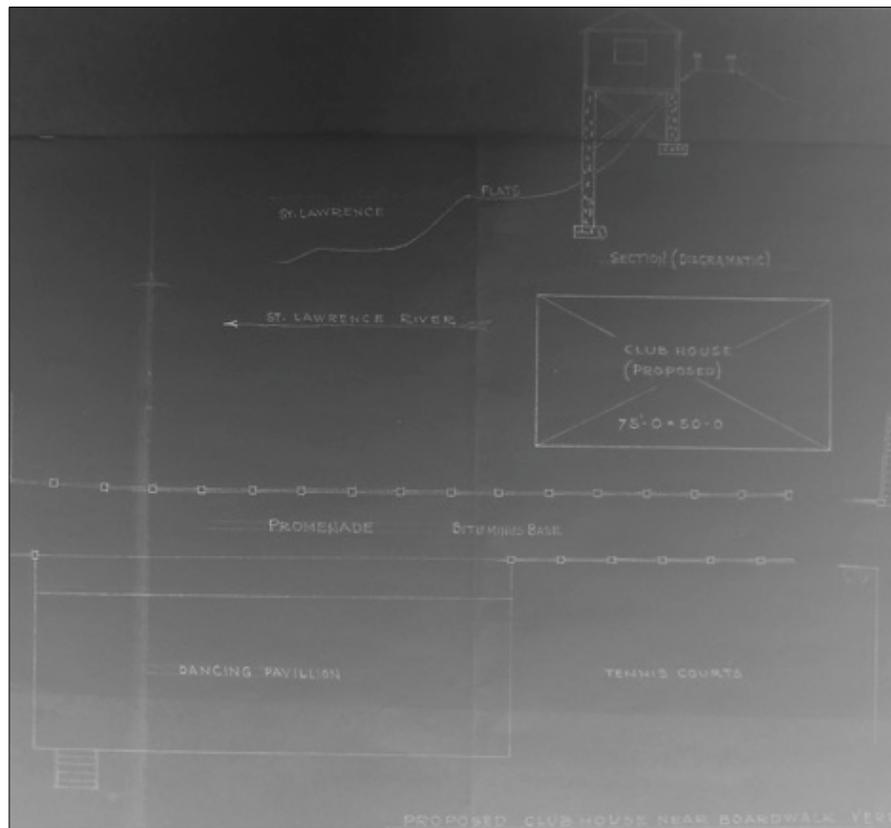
Sketch submitted by Verdun Yacht Club proposing the construction of a club house opposite of the Pavilion (image inverted for legibility), 1948. Borough of Verdun Engineer's Office.
